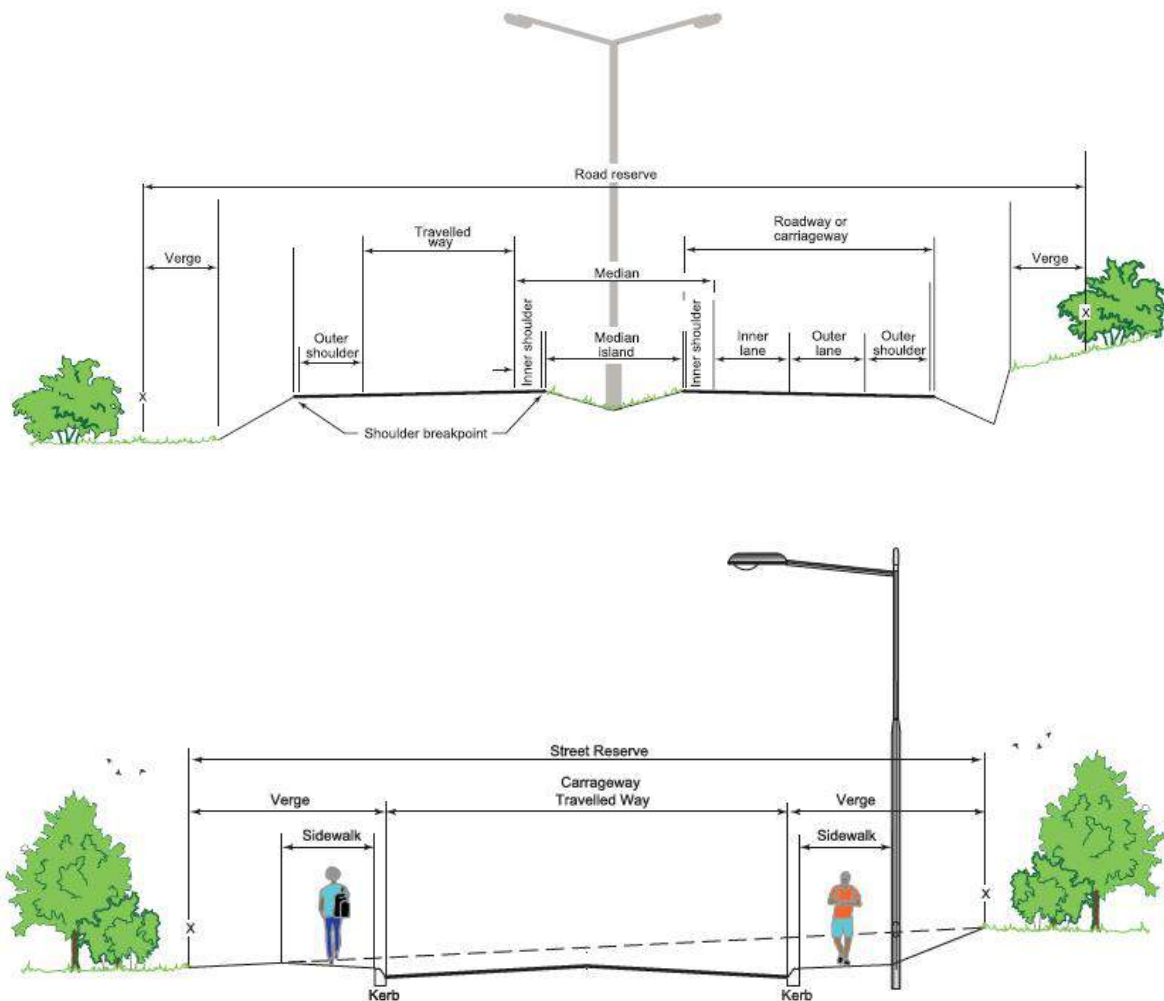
Nomenclature used for road (above) and street (below) cross section
